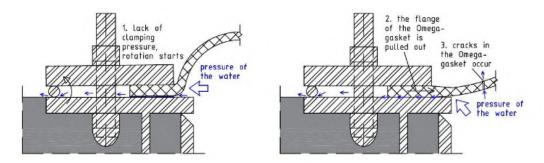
Failure mechanism of Omega seal (Van Montfort, 2018)
